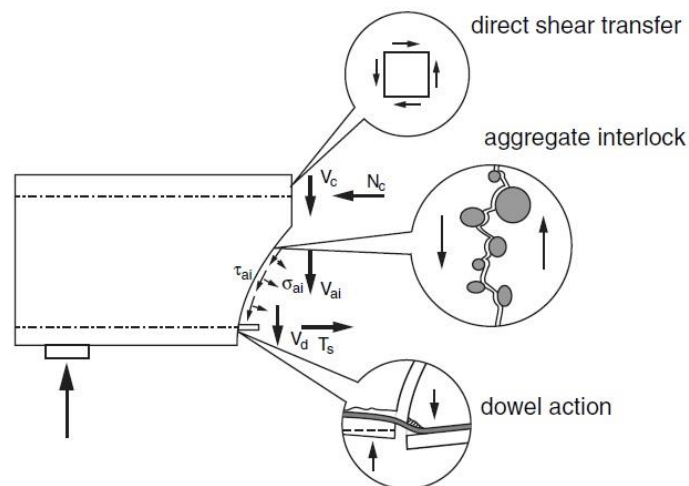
Free body of a flexural shear crack with three main shear transfer mechanisms. Each one of the mechanisms contributes to the whole shear bearing capacity of a beam. The contribution of each one of the components is calculated using the following equations:
